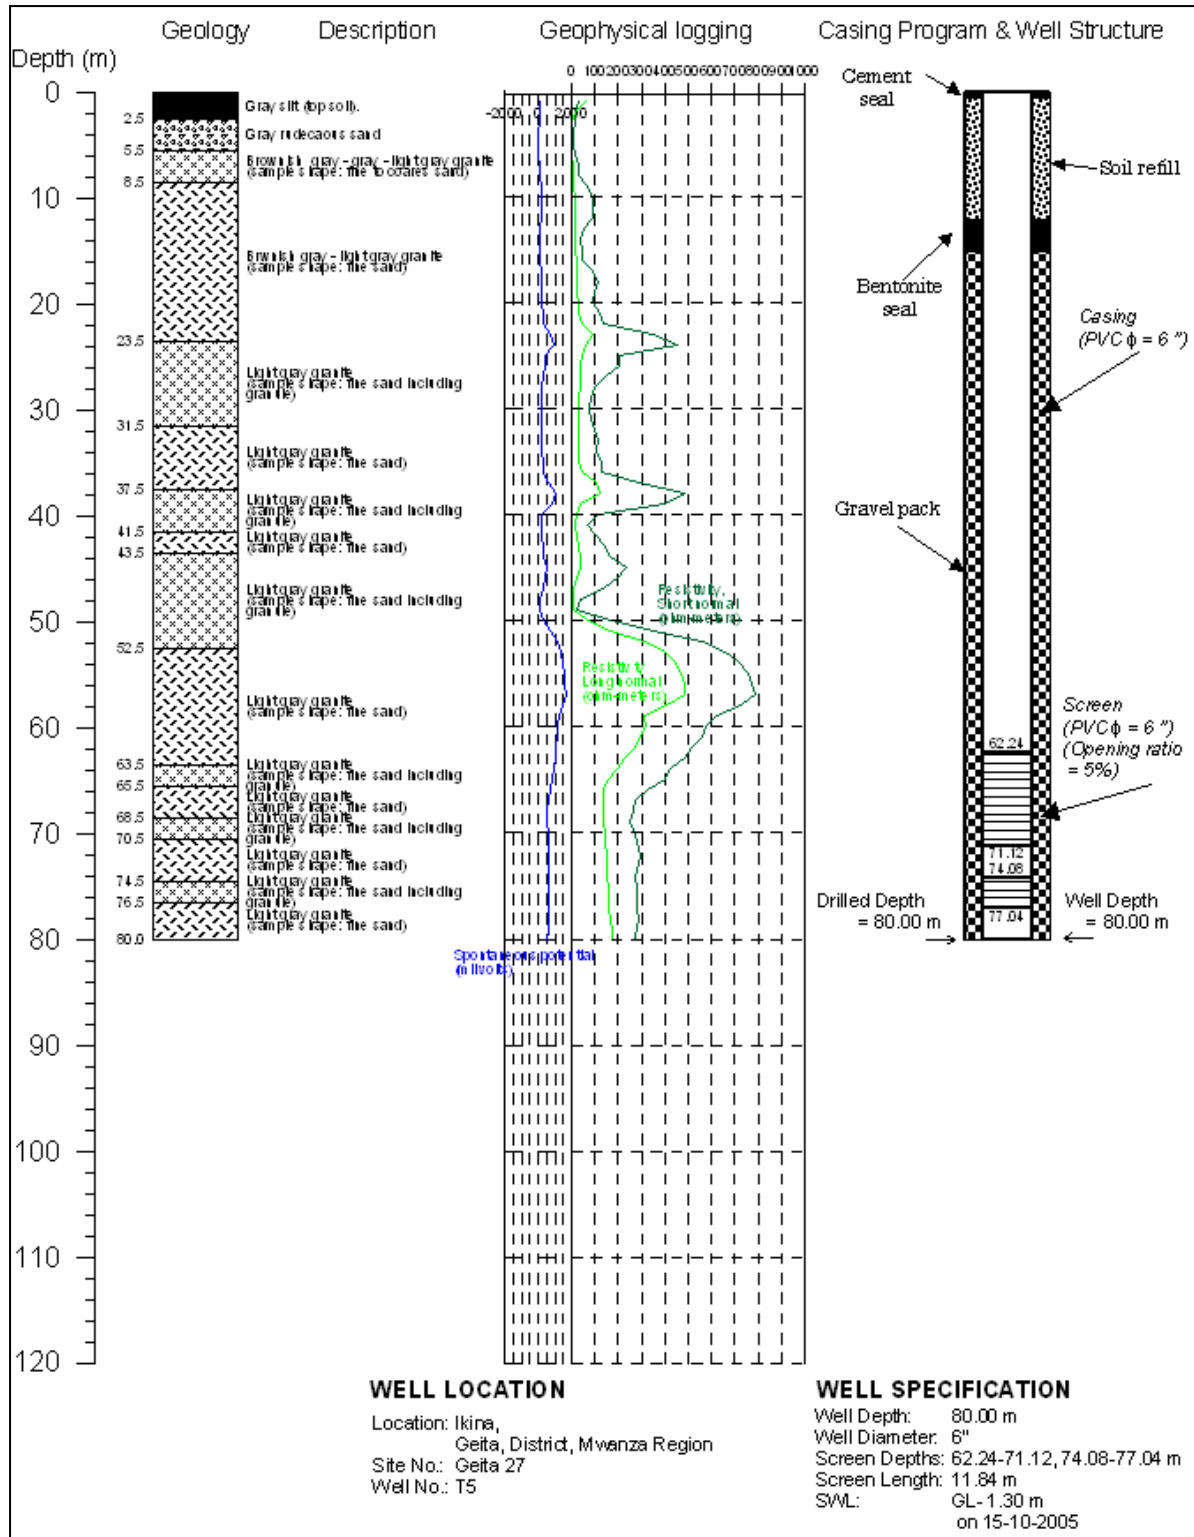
Columnar and Section and Well Structure (Ikina)
